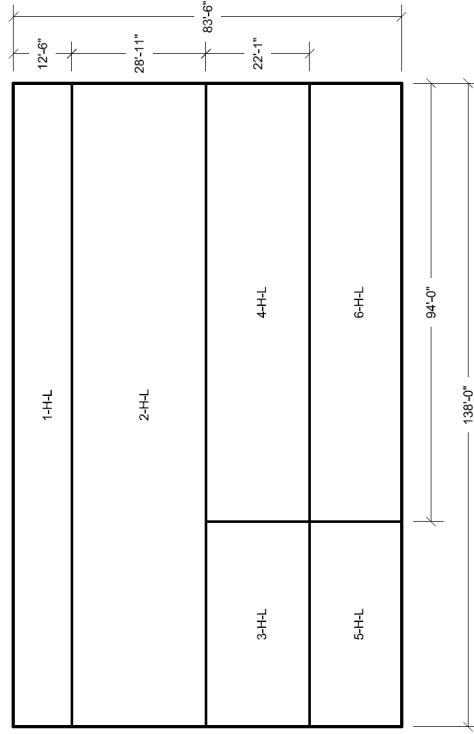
H.6-97: UHS BASIN WEST WALL LOOKING EAST
